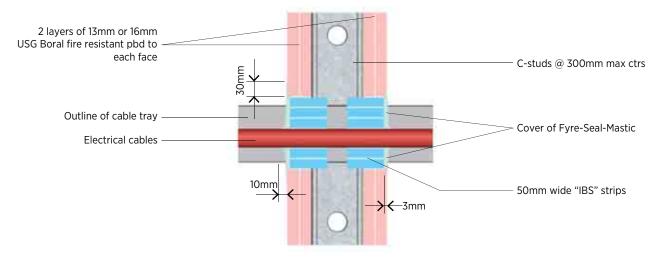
Penetration Detail - Cable Tray - Section Through Wall
